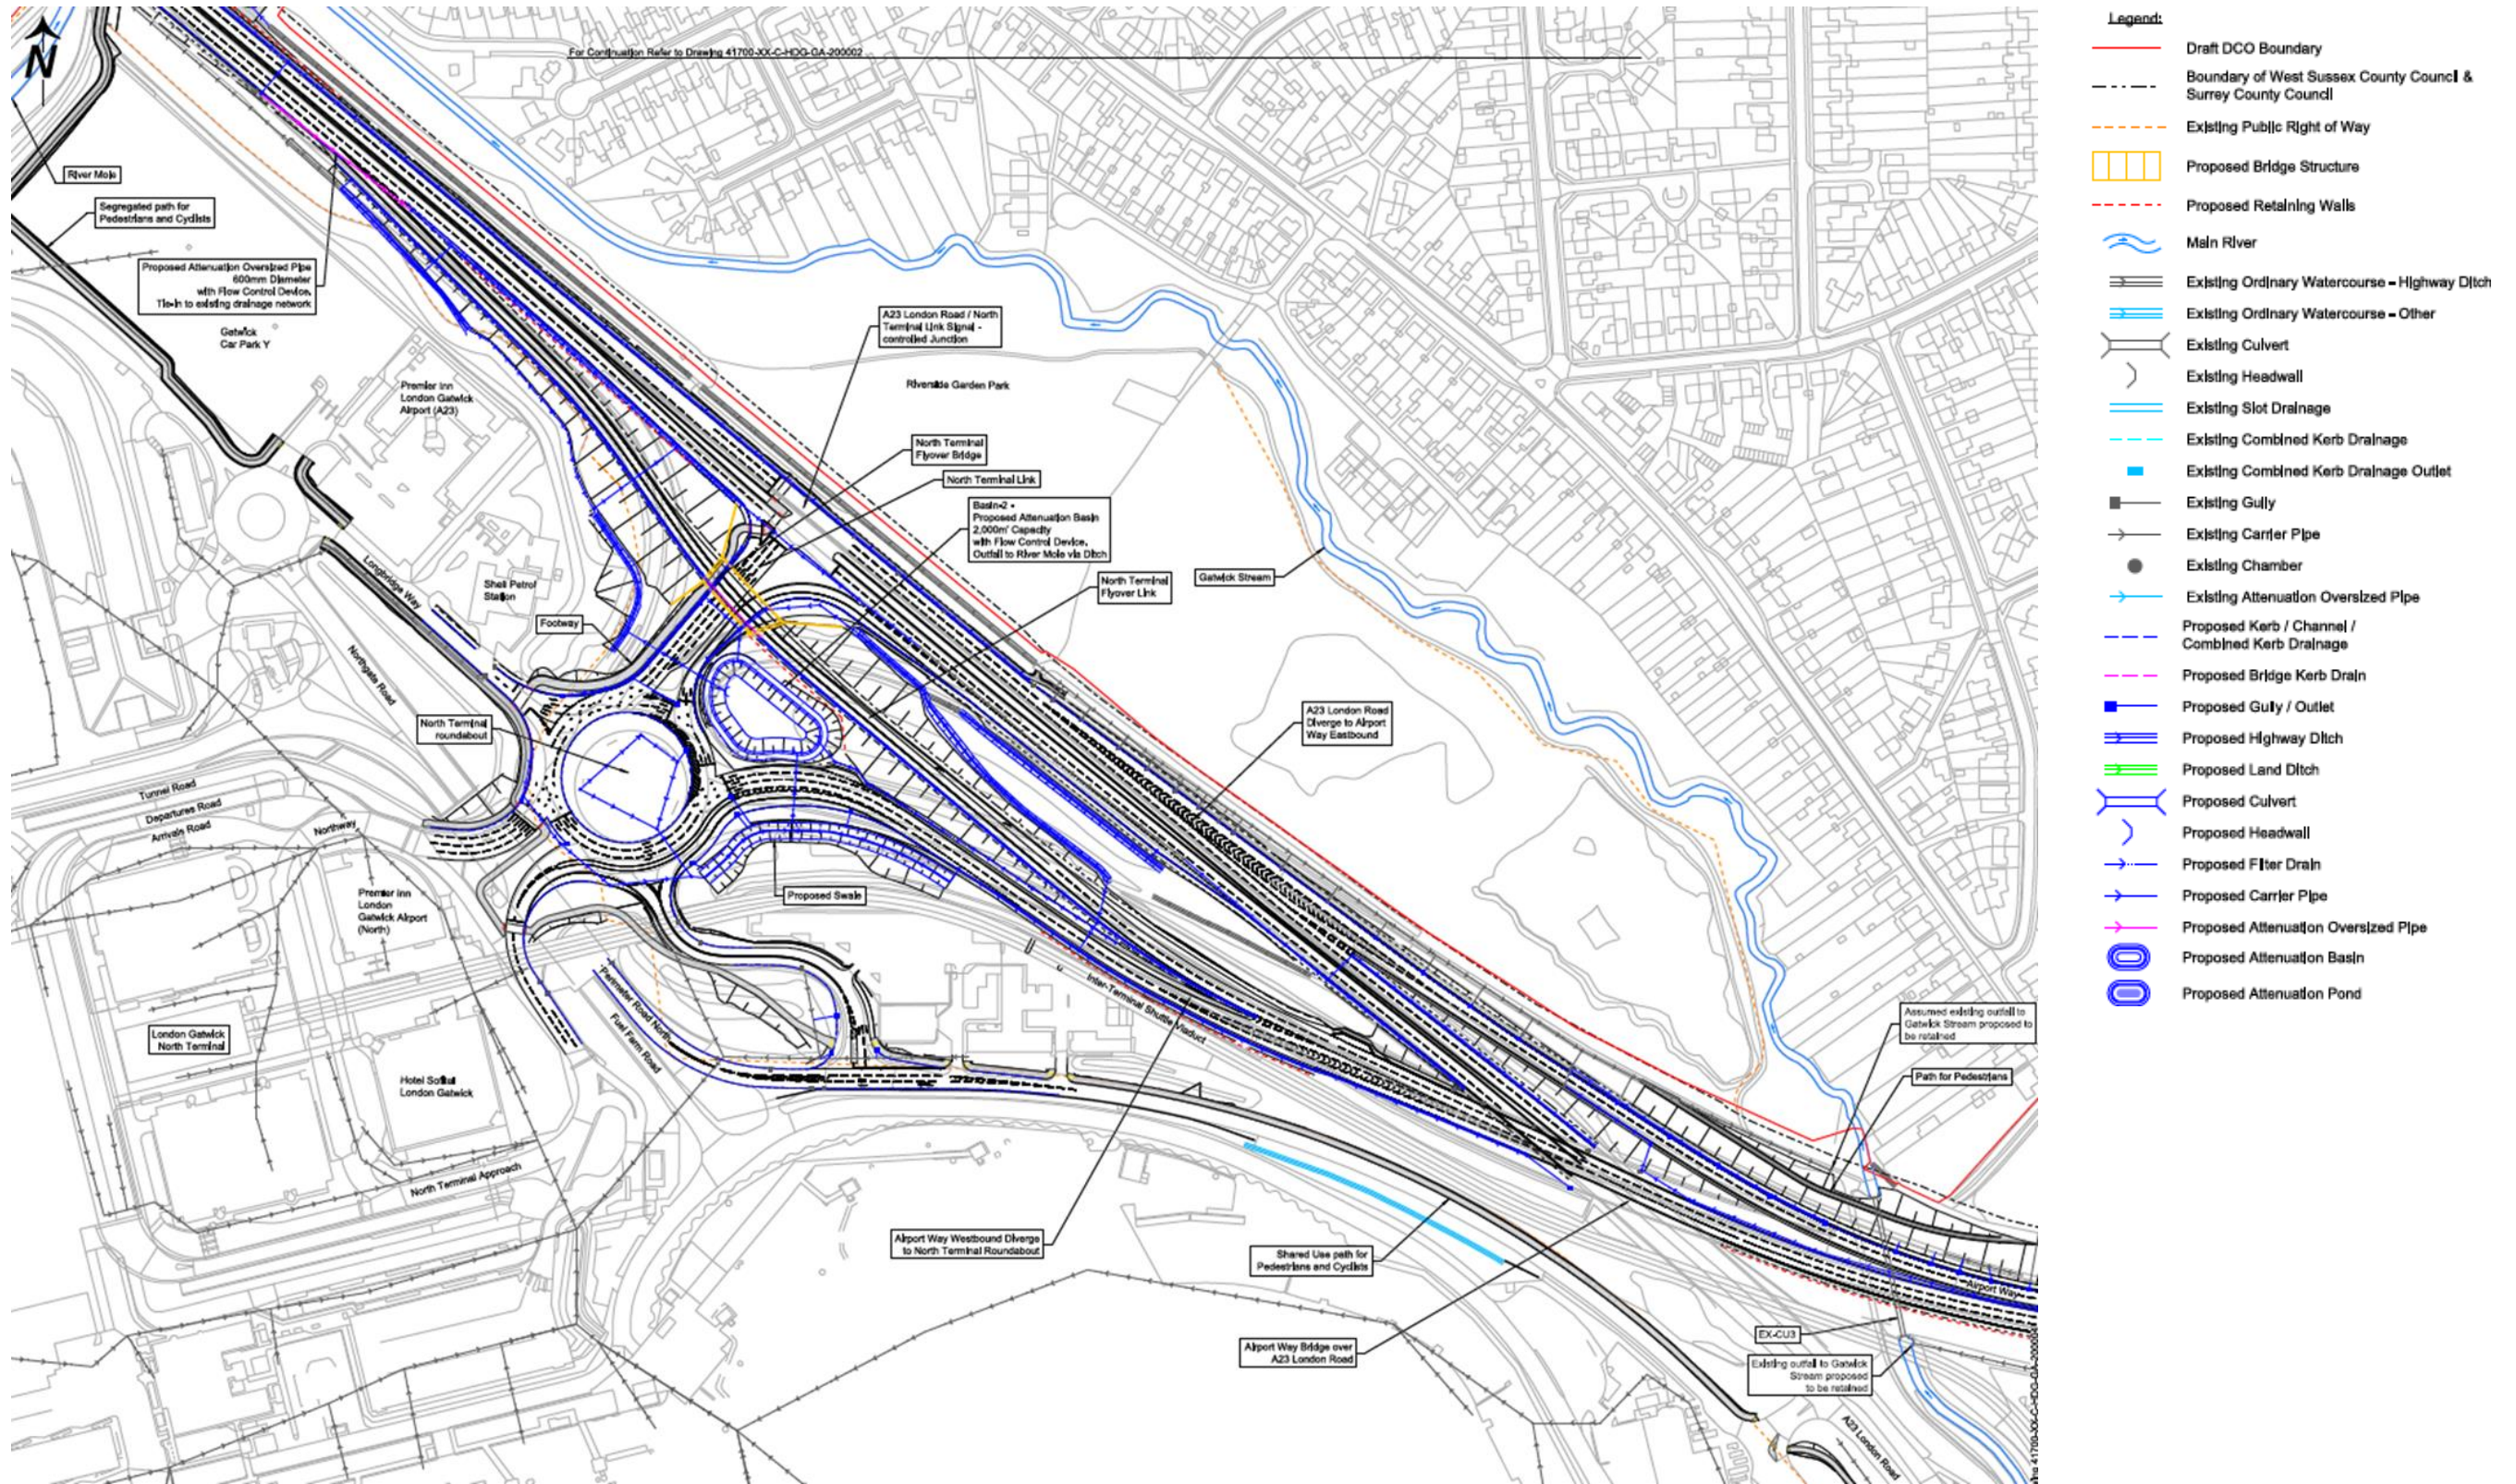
Preliminary Design Proposed North Terminal Roundabout Drainage Layout
